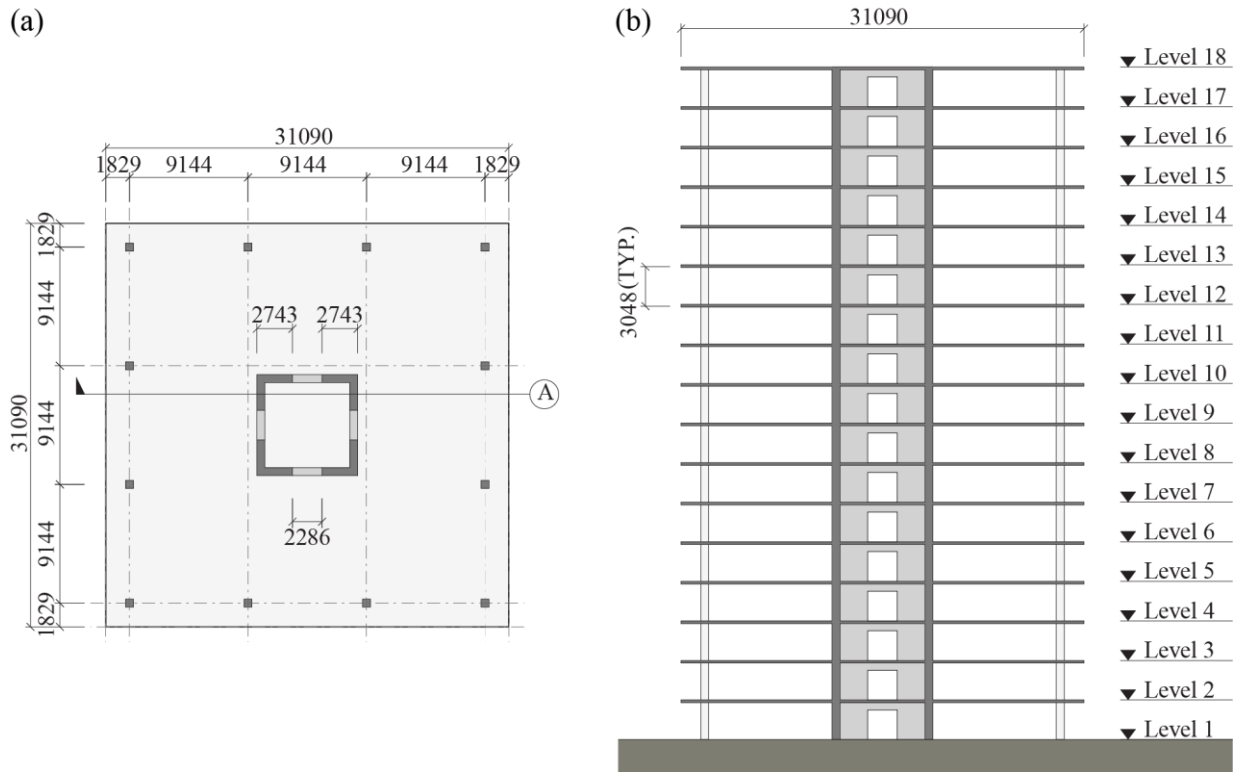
(a) Typical floor plan and (b) section A of the eighteen-story building (all dimensions are in millimeters)
